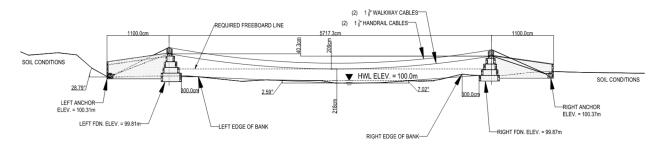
Design #1 Non-Standard Geometric Layout.
